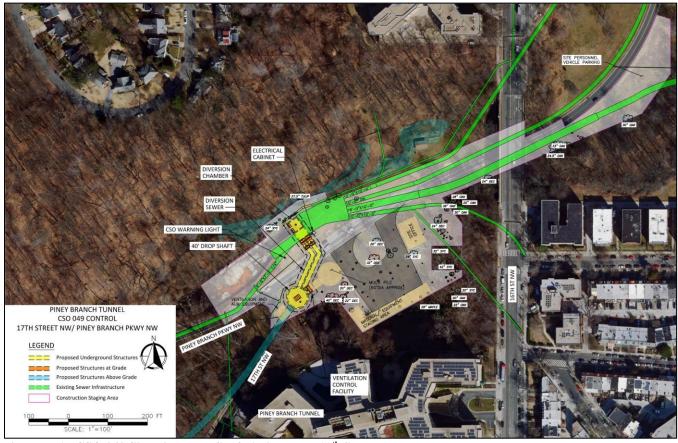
CSO 049 Site with Drop Shaft Adjacent to 17th Street NW
